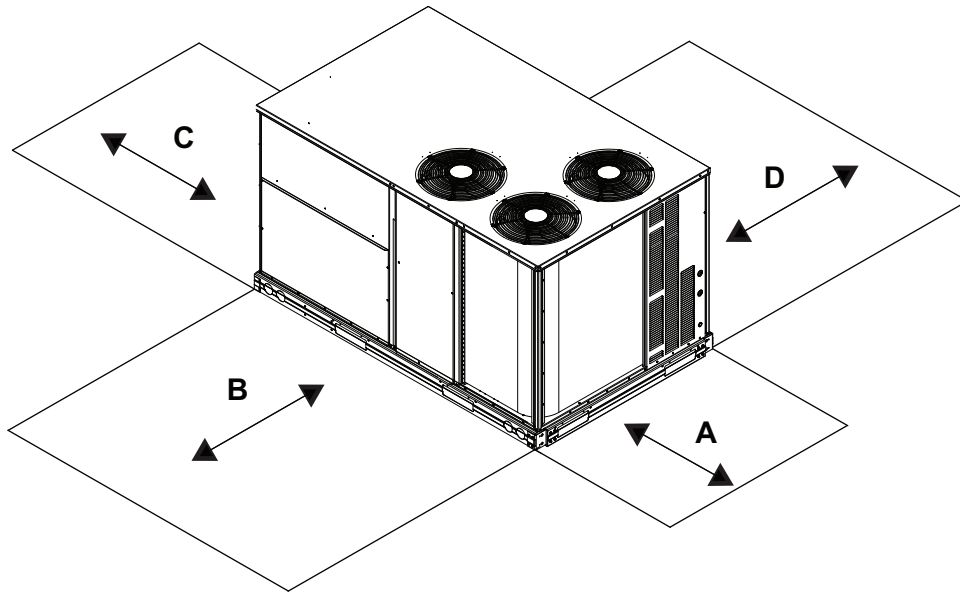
Unit Dimensional Drawing, Size 09 and 12 (cont)
